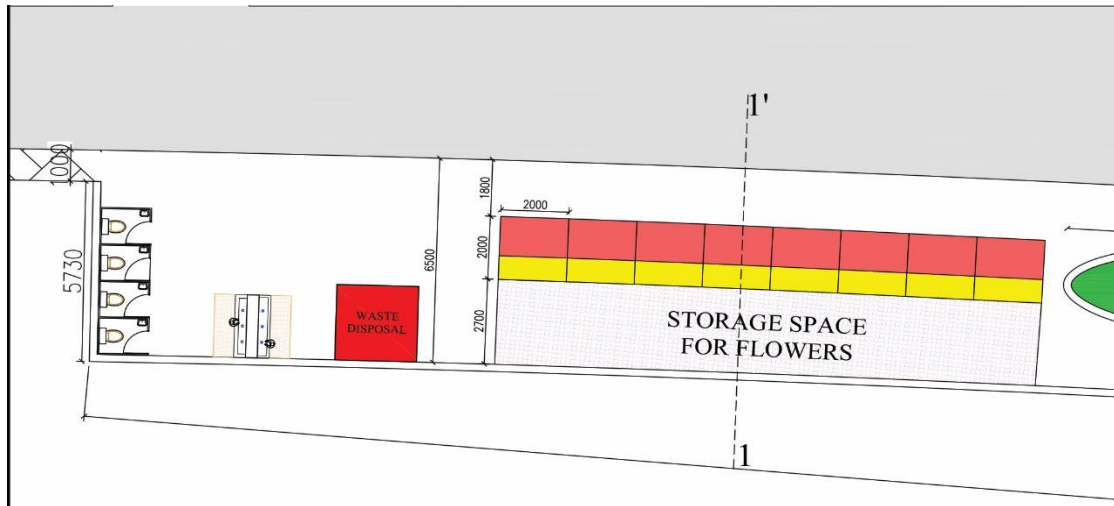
Detail Plan for Akashvani Road, Near Amar Hotel
